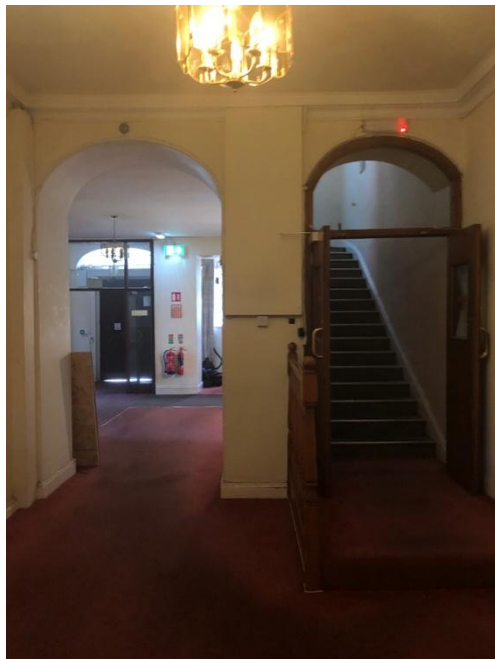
Facing south east, view of later stair to 1st floor from rear of reception area
